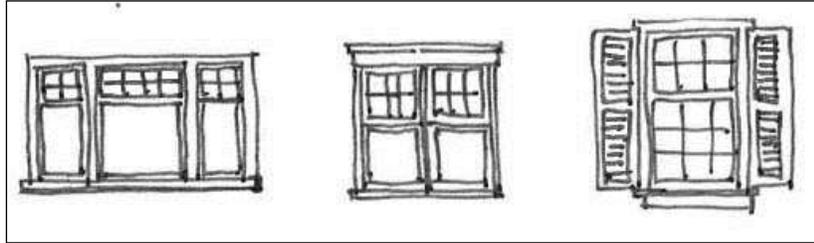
WINDOW DETAIL ELEMENTS
